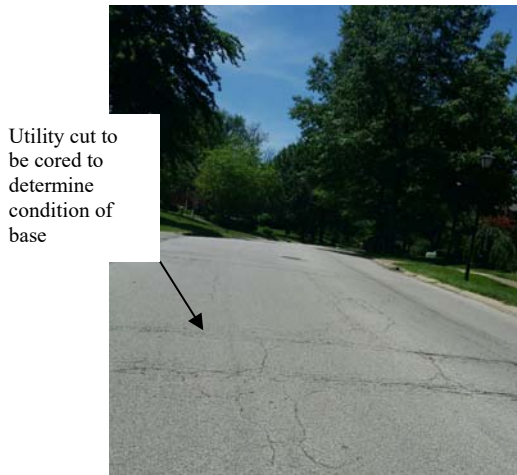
Roadway looking north just past south median leading to Shelbyville Rd
